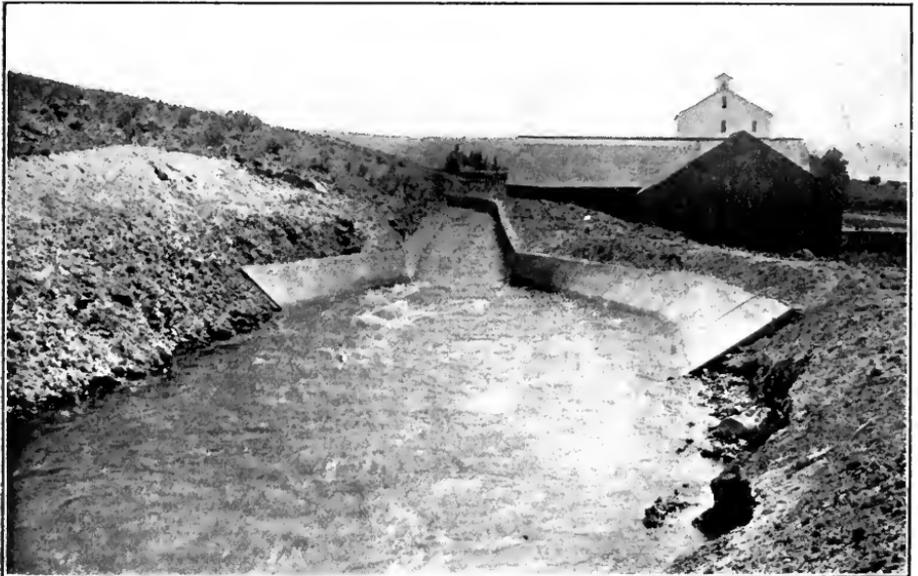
FIG. D.—Outlet transition at connection of semicircular concrete-lined canal with earth canal. Umatilla Project, Ore.
